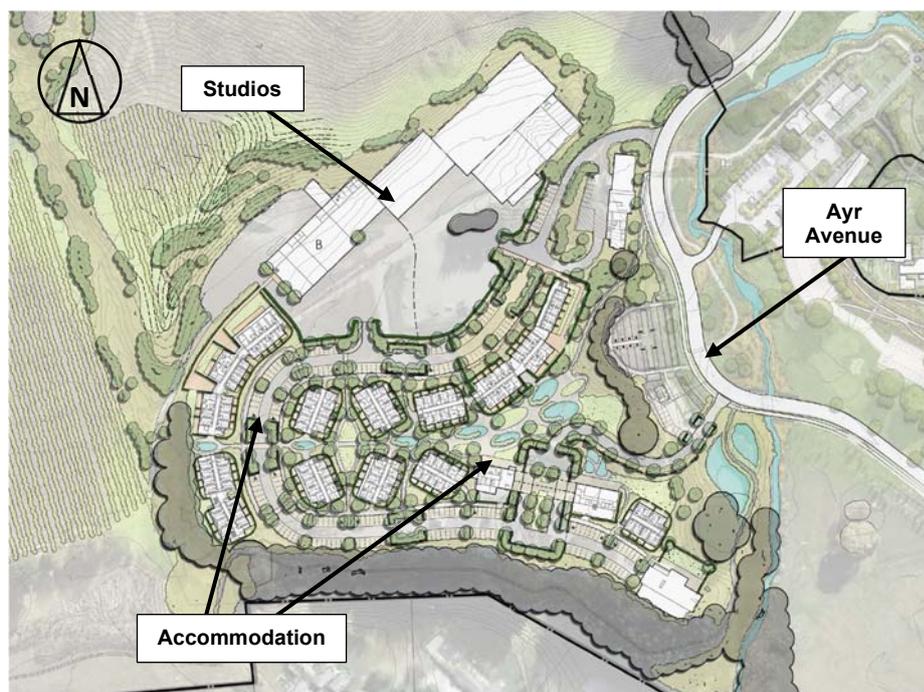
Proposed Site Layout (Extract from Winton Drawing, Annotated)
